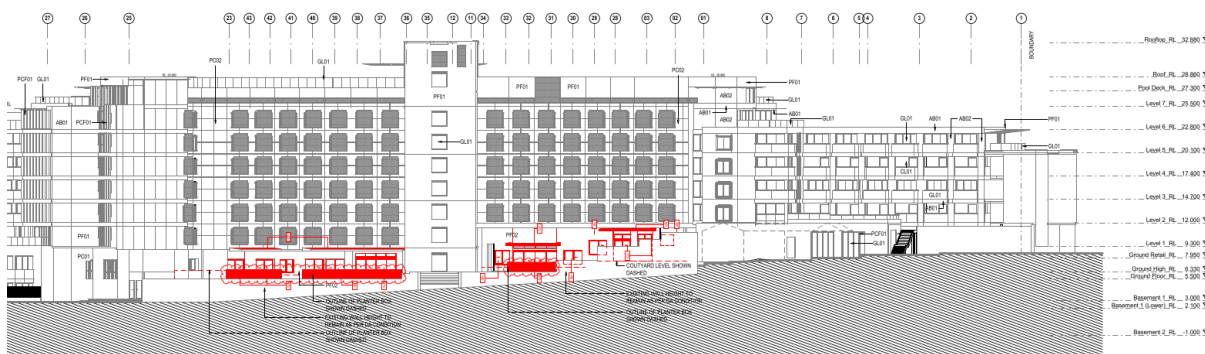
Proposed North Elevation (with lobby glazing modifications, and new terrace awnings shown in red)
